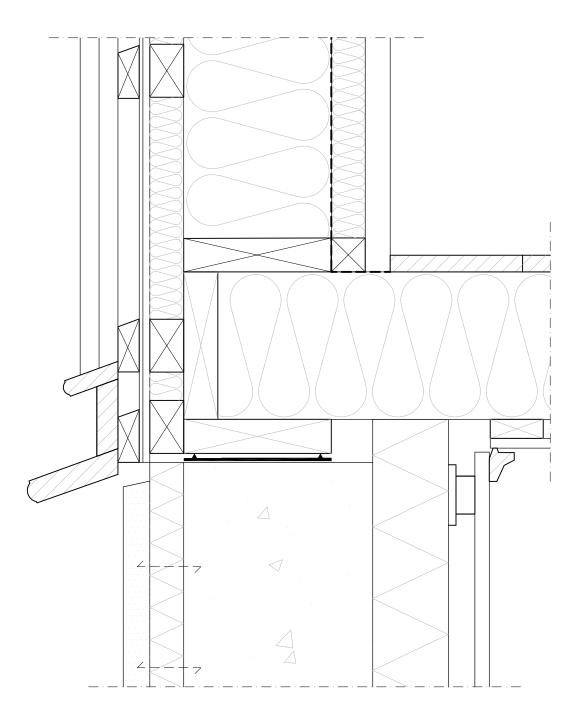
Detail showing wall meeting foundation, scale 1:5.
